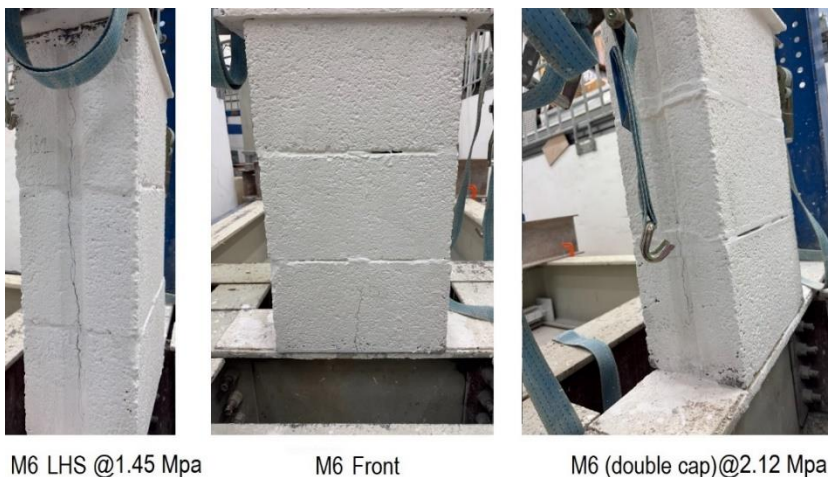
Initial Cracking of Mortar Transverse Full Wallettes
